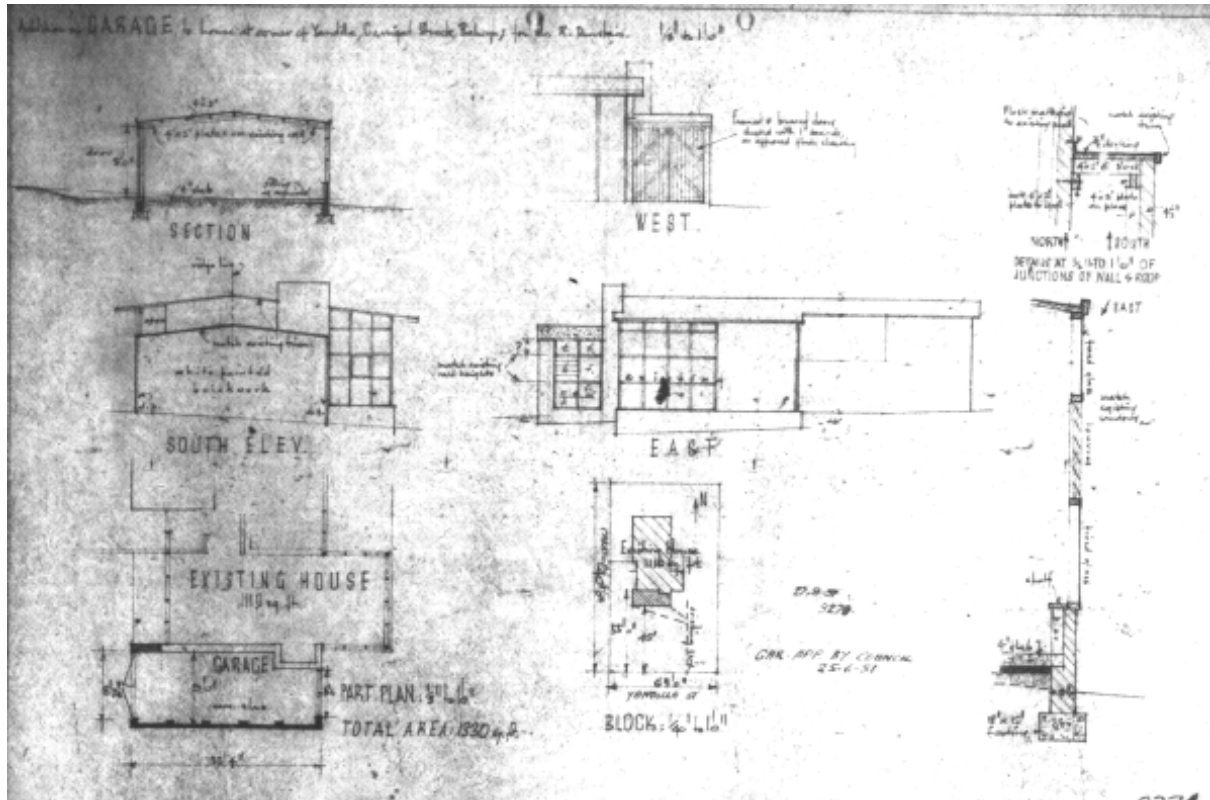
Building application plan showing the proposed garage addition. (Source: BP 1951)
